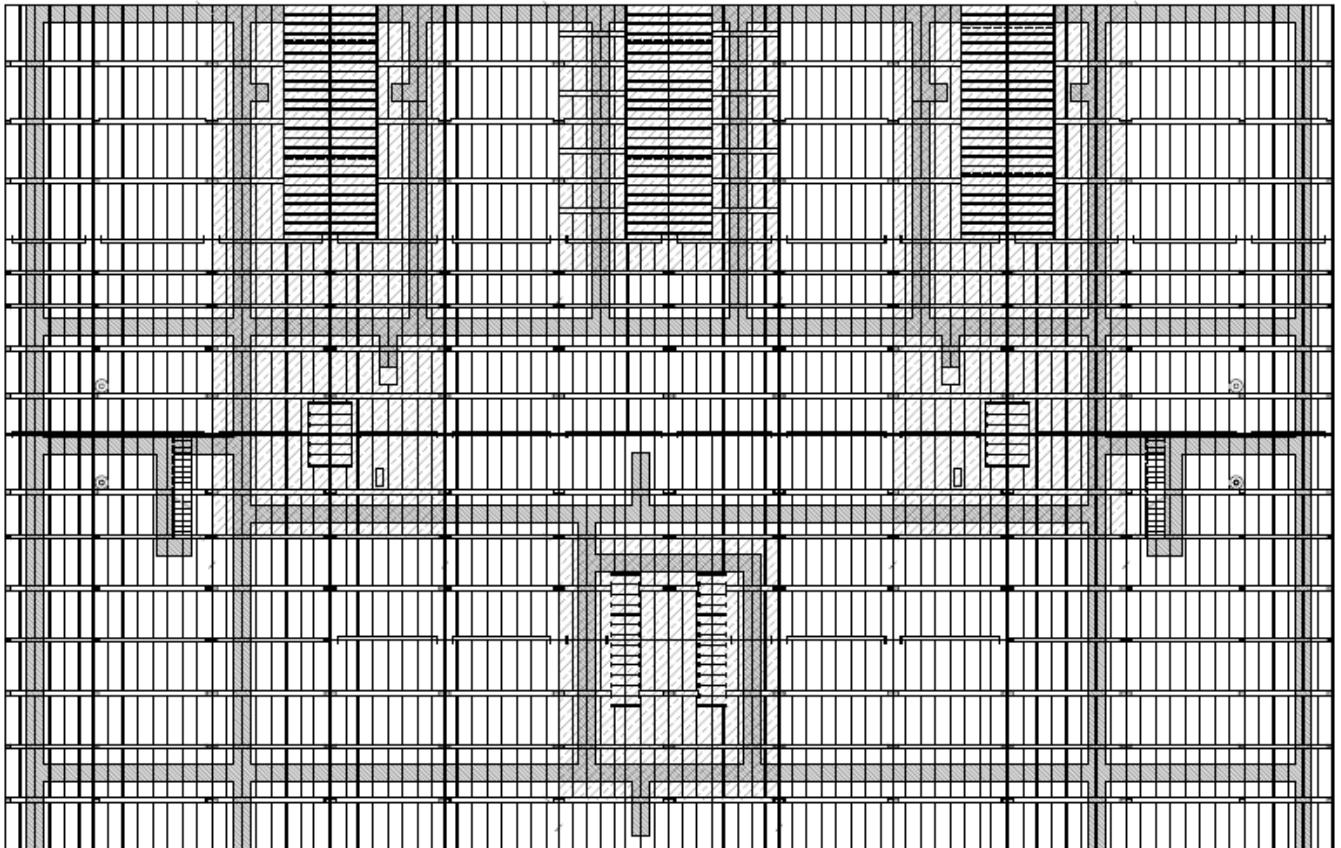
Access around bearing area at suspended deck landing (Sicilia side shown - extract)
